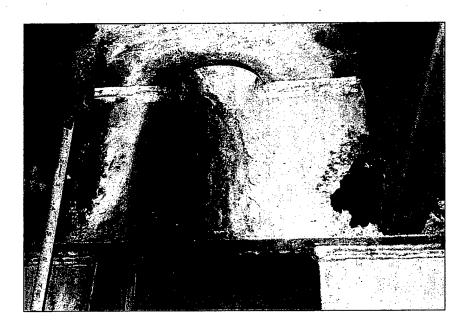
Corrosion beneath bottom horizontal girder. Looking up at girder flange and drain hole. Stiffener at right, typical.
